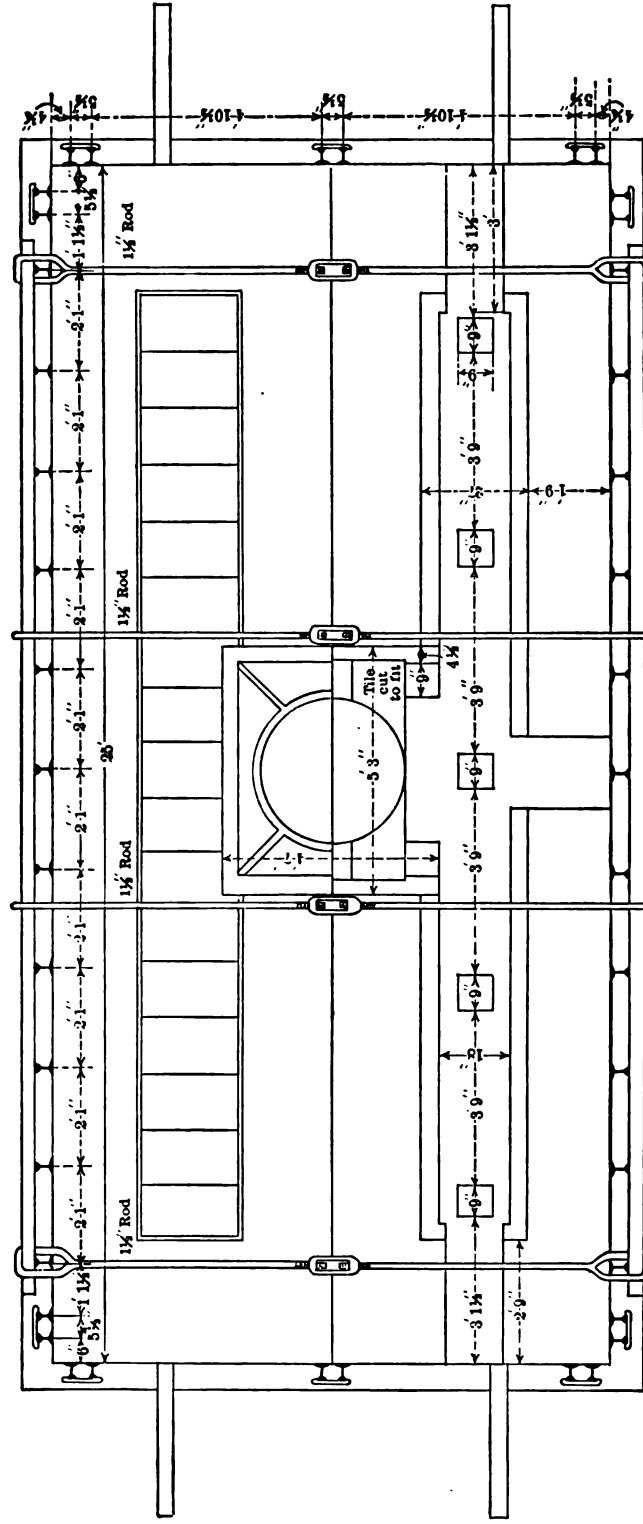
TYPE OF FURNACE USED IN NEW JERSEY.
